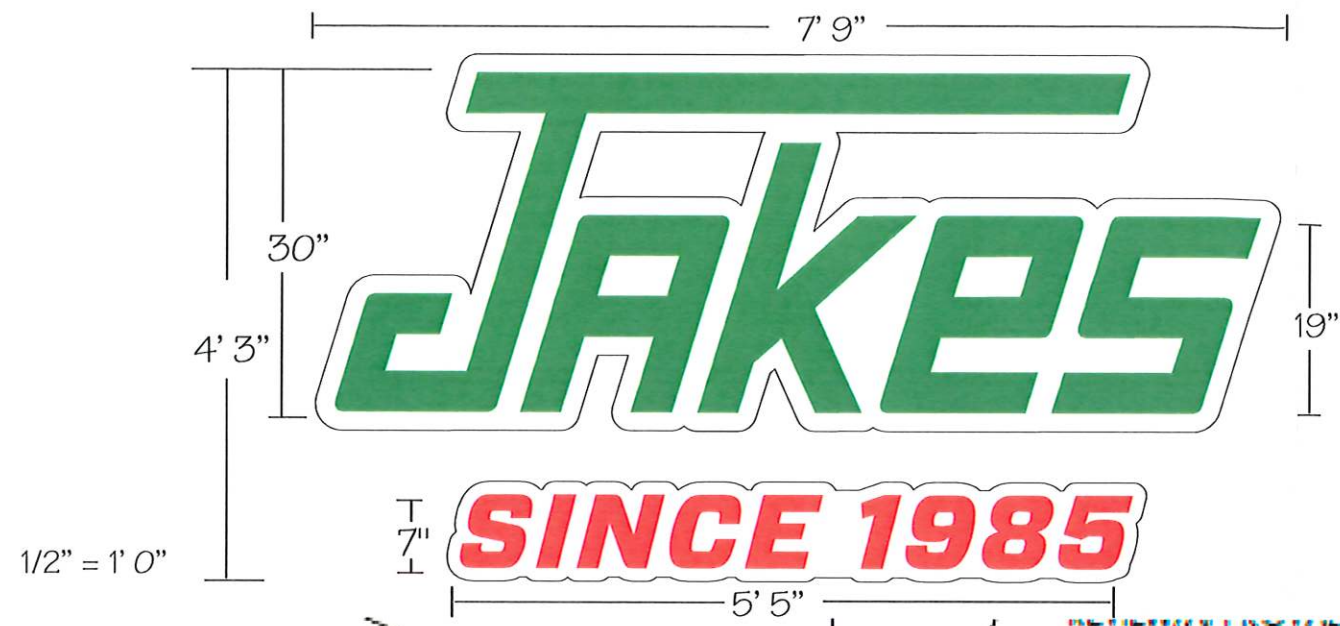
DETAIL: PROPOSED ILLUMINATED CHANNEL LETTER WALL SIGN
